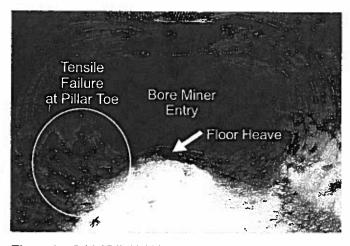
Initial Rib Slabbing and Floor Heave in Response to Yielding of Pillar Foundation
